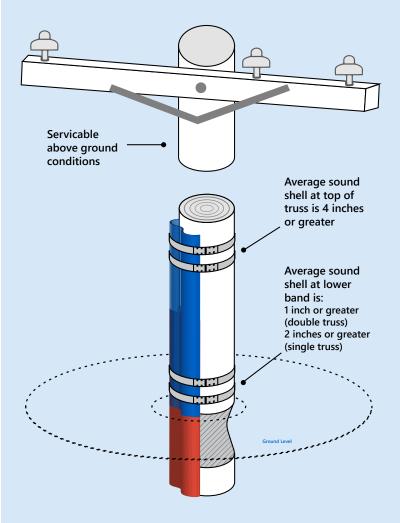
Minimum Wood Pole Condition Requirements for Steel Truss Restoration
